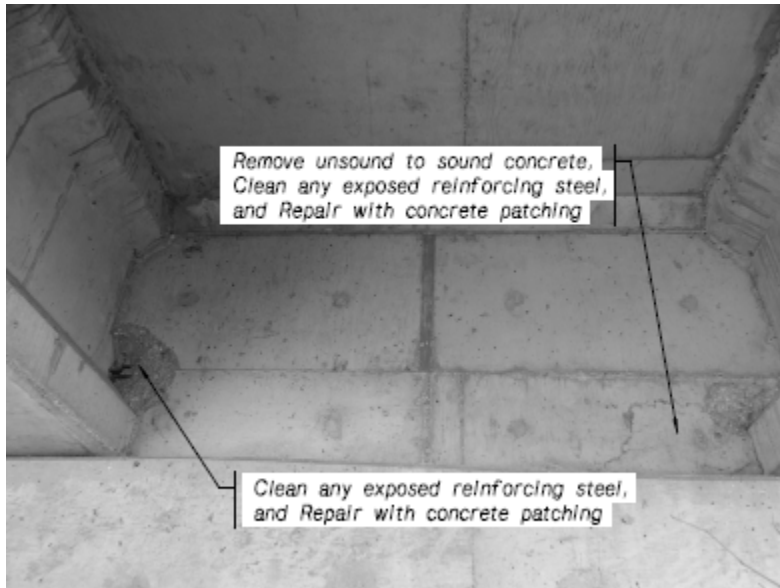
Damage at girder ends and diaphragm, Platte River South Bridge, courtesy of NDOT
